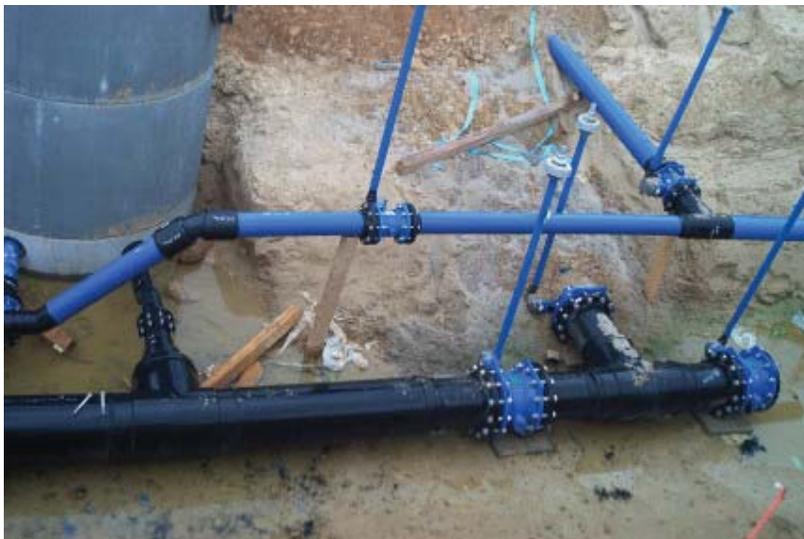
Fittings being fixed in the fire main and drinking water pipe
